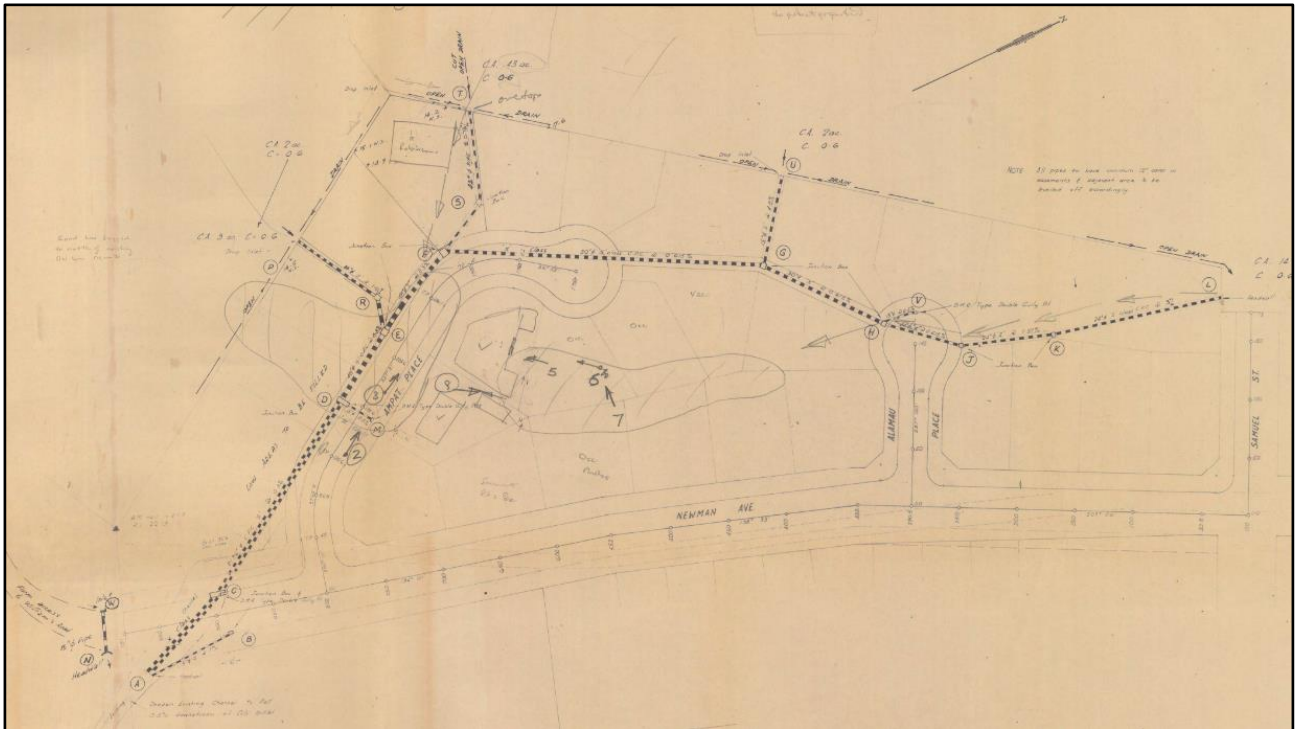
Drainage network Ampat Place, Samuel Street and Alamau Place (McGlashan & Crisp, 1972)
